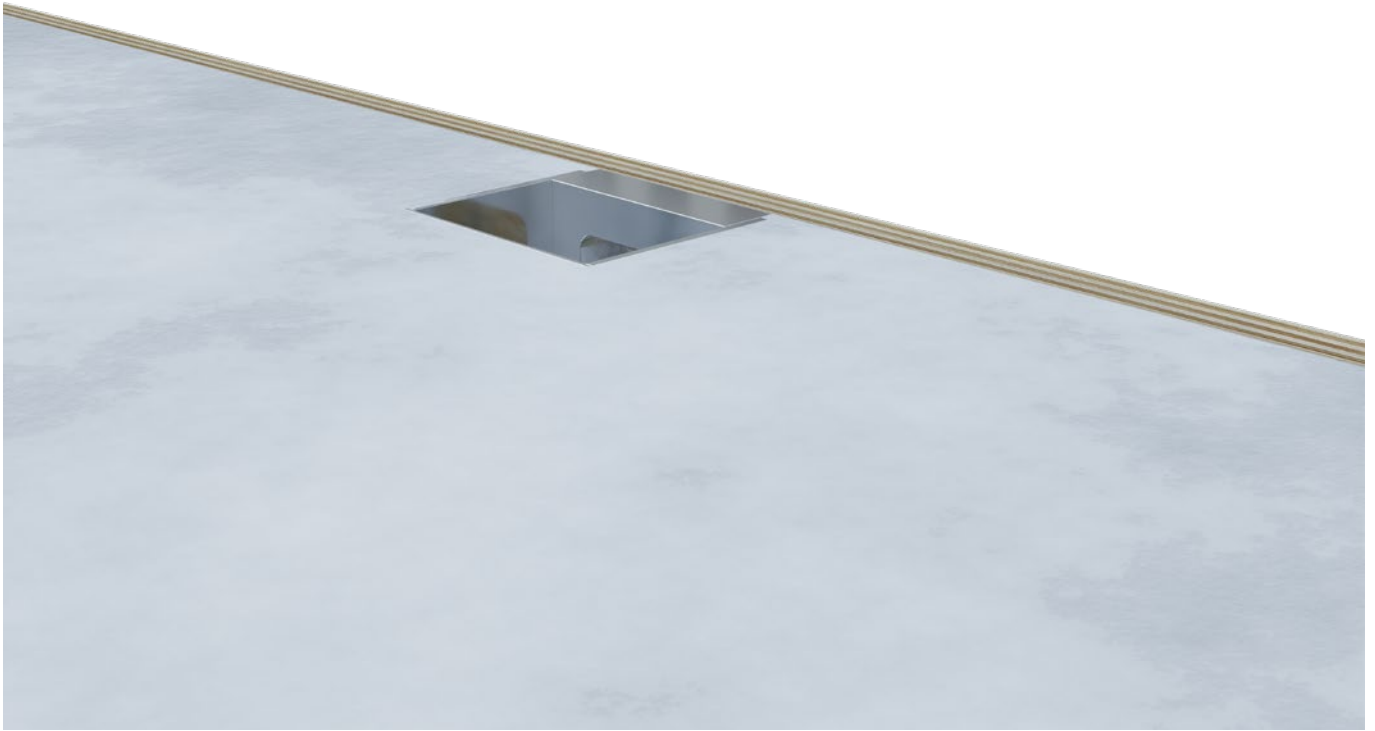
REMOVING OF THE PRECAST CONCRETE ELEMENT FROM FORMWORK. GRIP CREATED IMPROVED ROUGH SURFACE IN FUTURE JOINT AREA.
